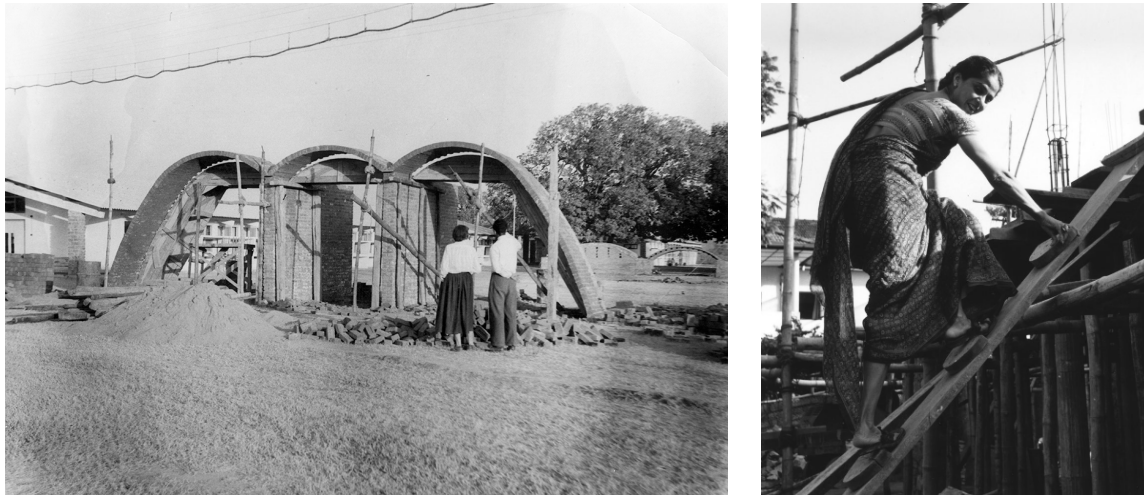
(upper left): Jane Drew inspecting the construction of arches in Chandigarh, c.1951-53. (Source: RIBA139786).
